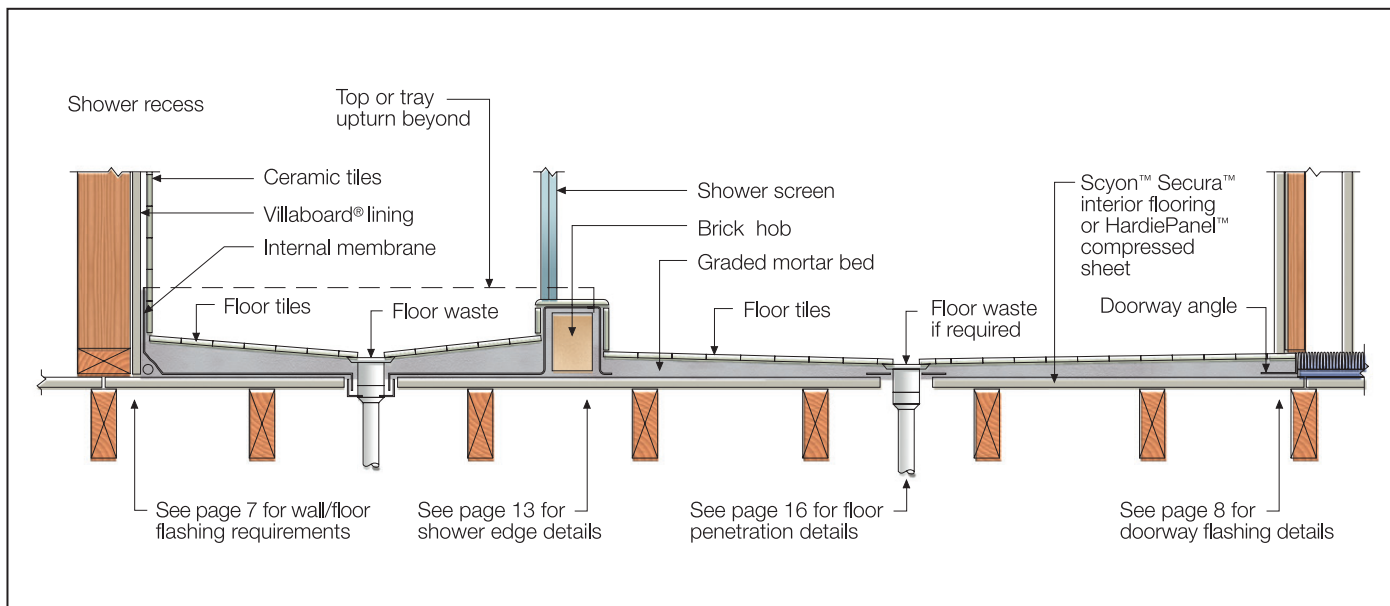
TYPICAL BATHROOM CROSS-SECTION
